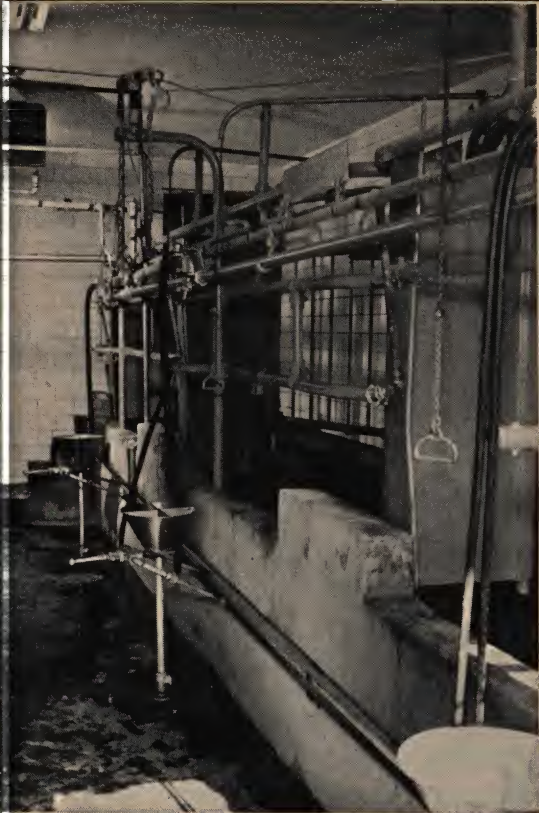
Interior view of a 3 stall tandem milking parlor. Note interior wall finish of ceramic tile.
